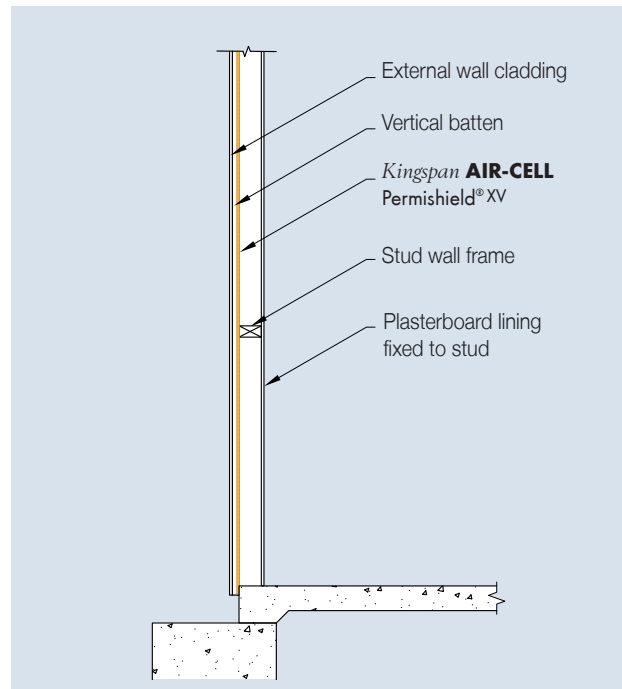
Side elevation of Kingspan AIR-CELL Permishield® XV on timber-framed wall
